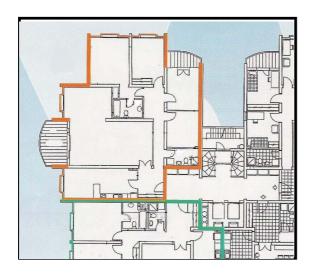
Detail of floor plan in Albatros Apartment Building (1-16th floors)
